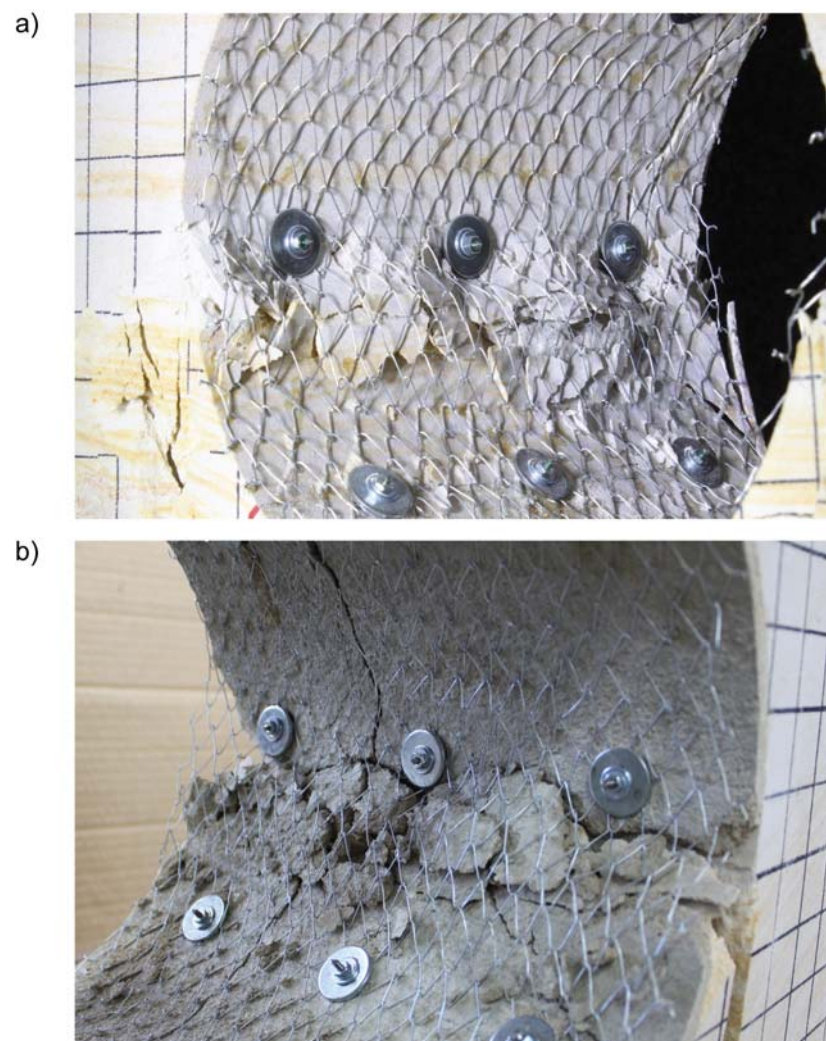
Tunnel sidewall after failure a) chain link mesh and rock bolts (Specimen No.9) b) 5 mm shotcrete layer, chain link mesh and rock bolts (Specimen No.11).
